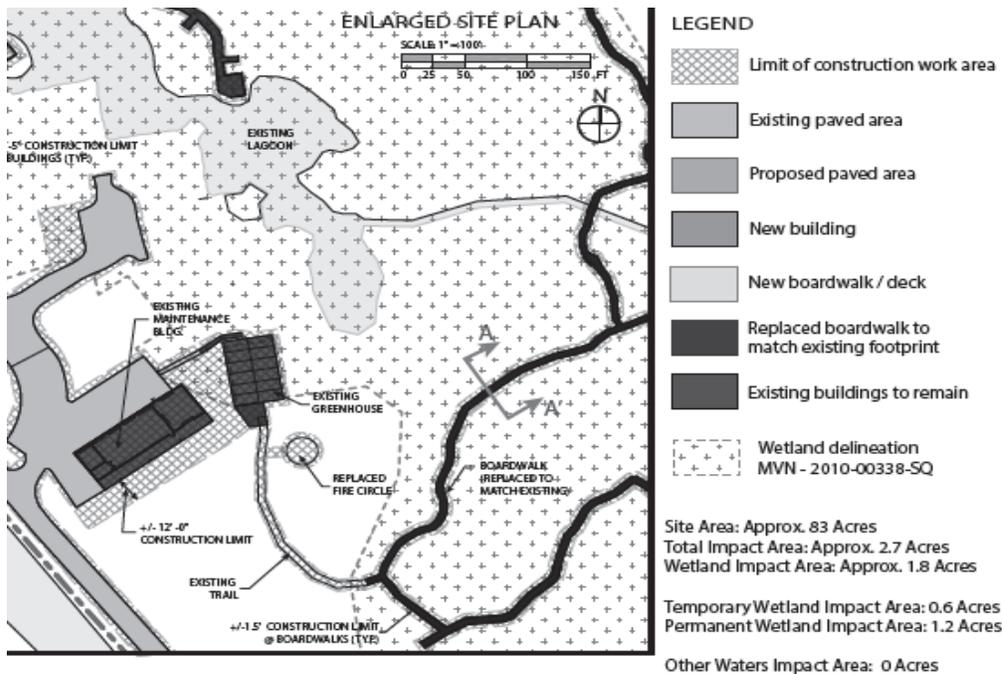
Site of ANC, showing the proposed building removal and two existing buildings to remain.
